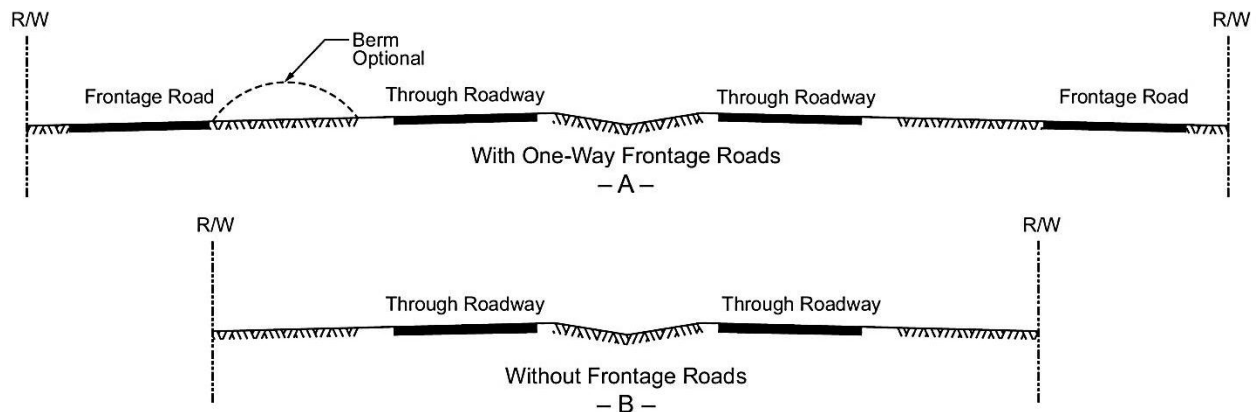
/7: Typical Cross Section for Ground-Level Freeway [1, p.8-23]
